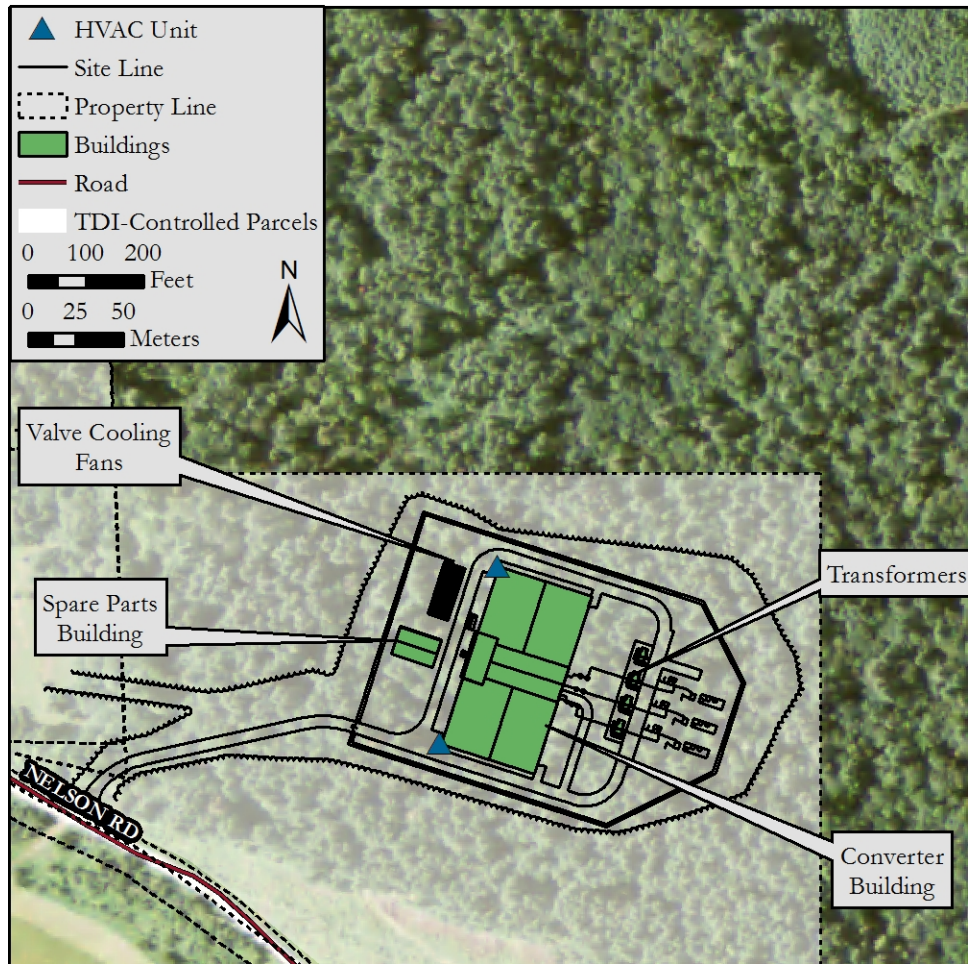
SCHEMATIC LAYOUT OF THE PROPOSED SITE
